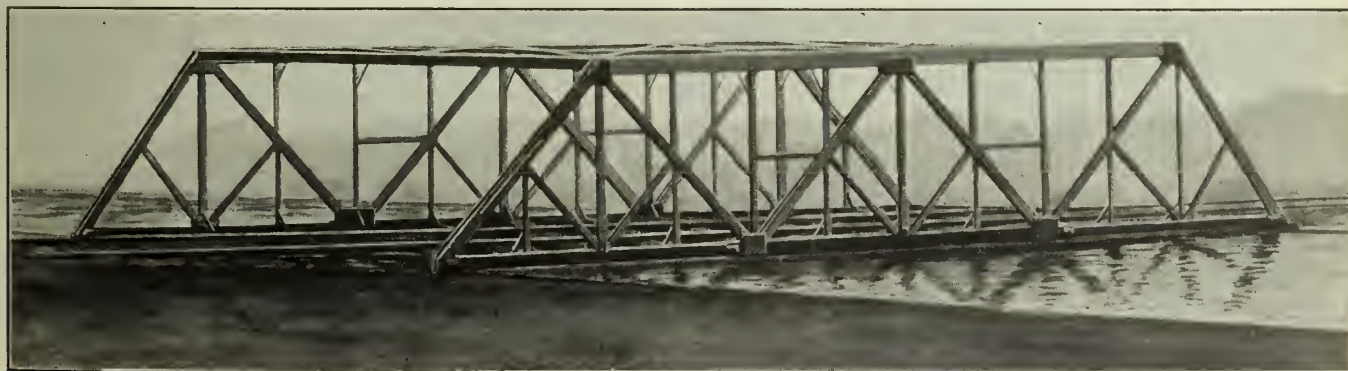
A Welded Bridge Designed to Carry a Spur of the Boston and Maine Railroad across a Canal into the Plant of the Westinghouse Company, at Chicopee Falls, Mass.
